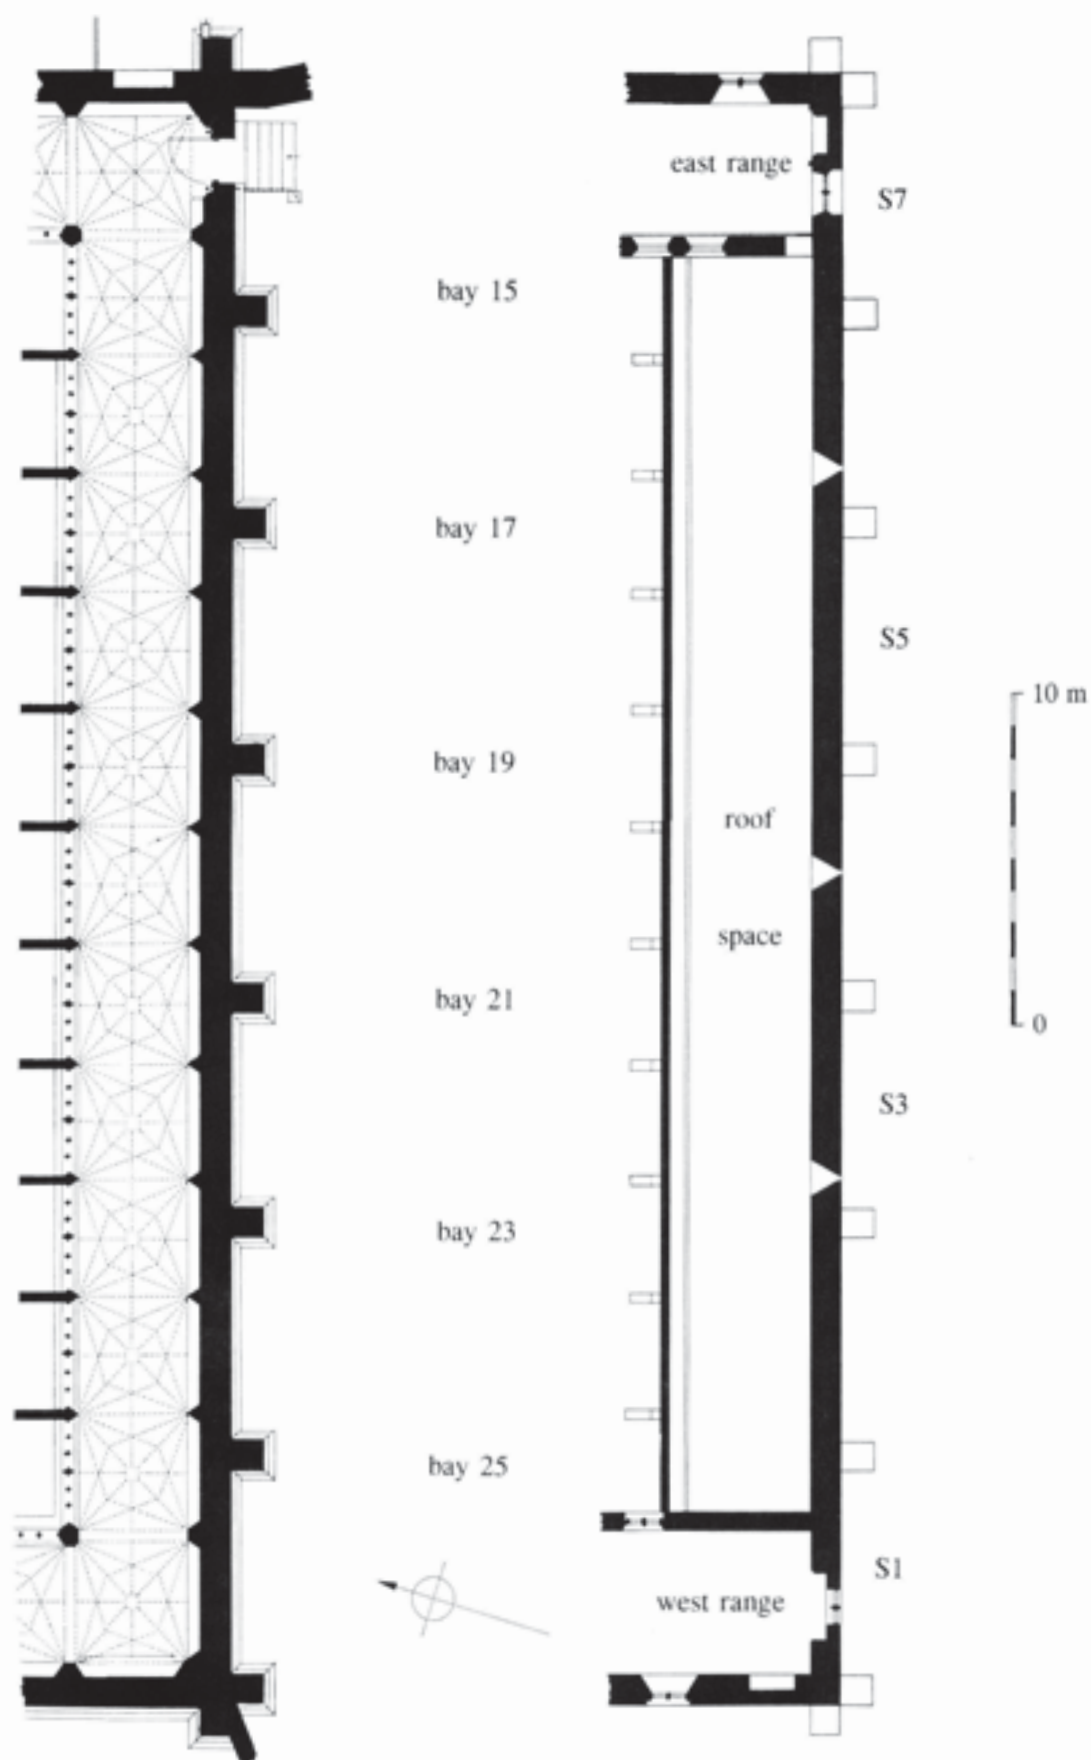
Plans of the south cloister at ground and roof-space levels (1978). The bay divisions of the external wall elevation are numbered S₁ to S₇
